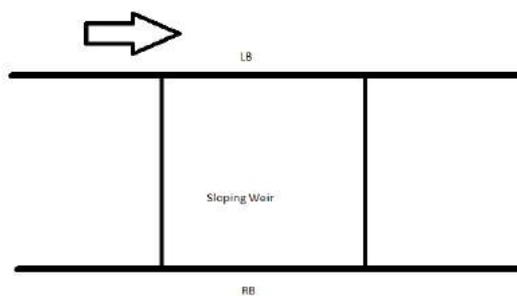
Site plan for Tidal Crane Barrier 8
